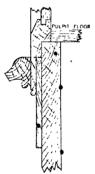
Section of Moulds and Framing at Level of Pulpit Floor.
